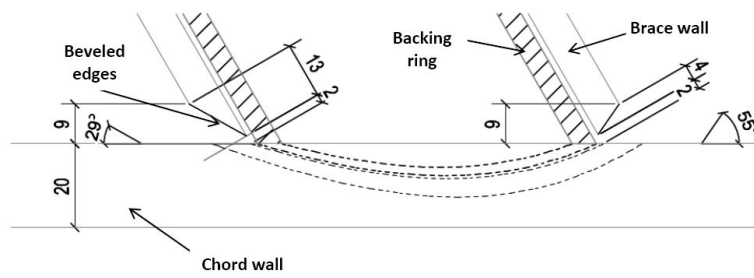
Tubular truss beam specimen (dimensions in mm).
